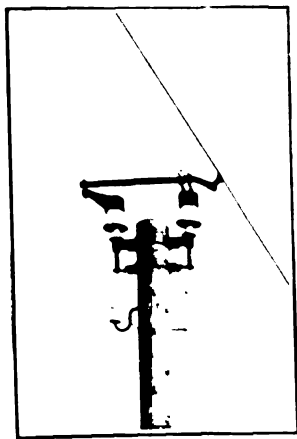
Single Wire Held by Wire-Holders Rigidly Supported.
